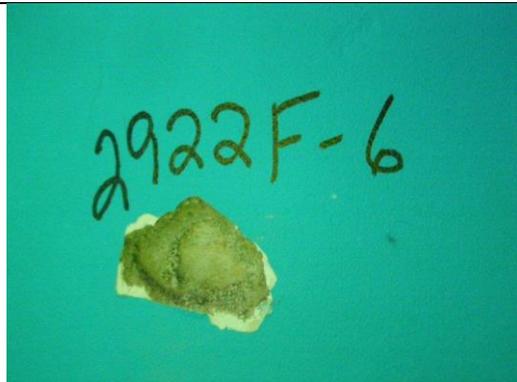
Plaster (2922F-6) Living Room, Wall A.
